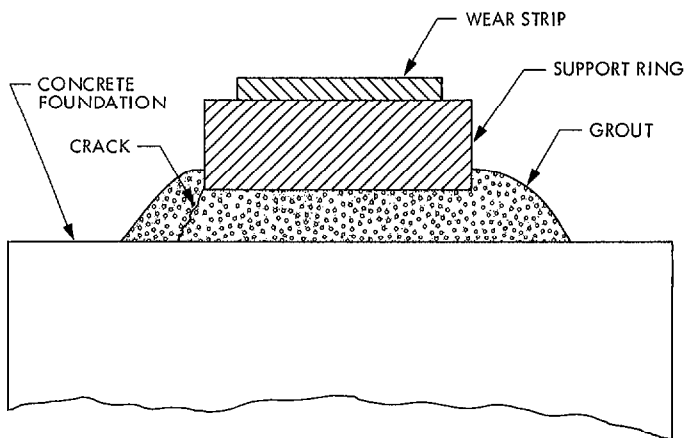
Cross section of track showing cracked grout shoulder on outer side
